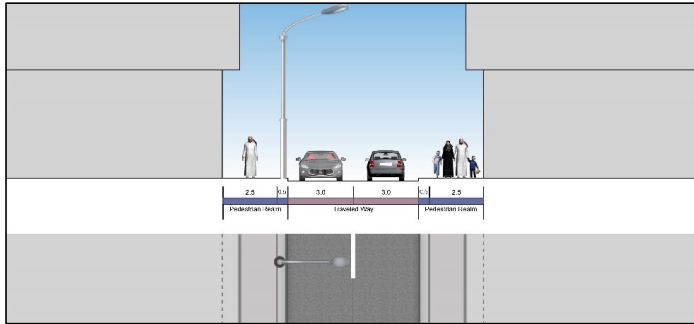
Cross Section of Typical City Access Lane at Abu Dhabi
